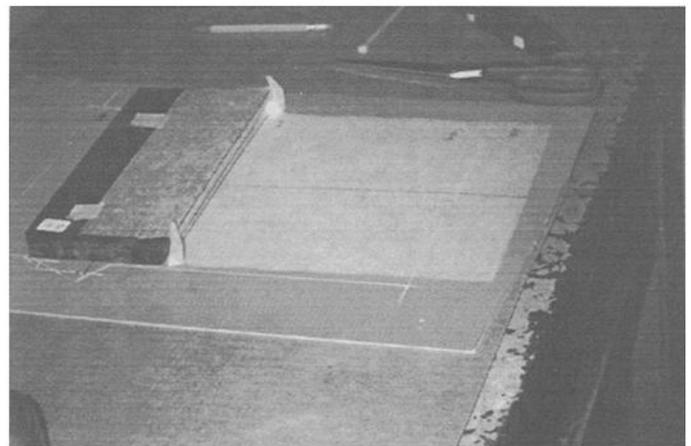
View of a geotextile reinforcement layer ready for placement.
